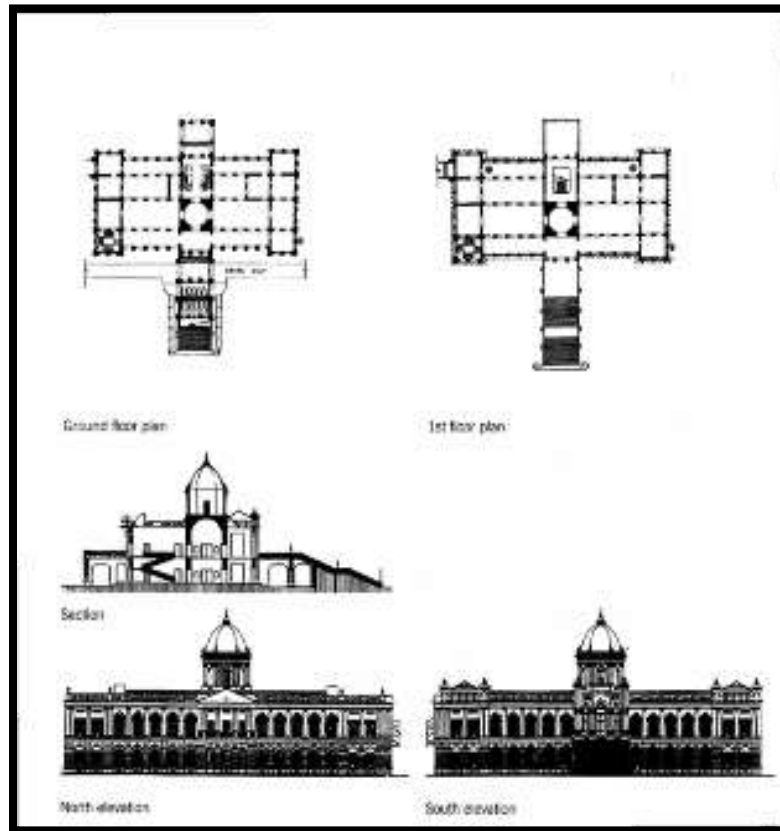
Plans, Section & Elevation of Ahsan Manzil
